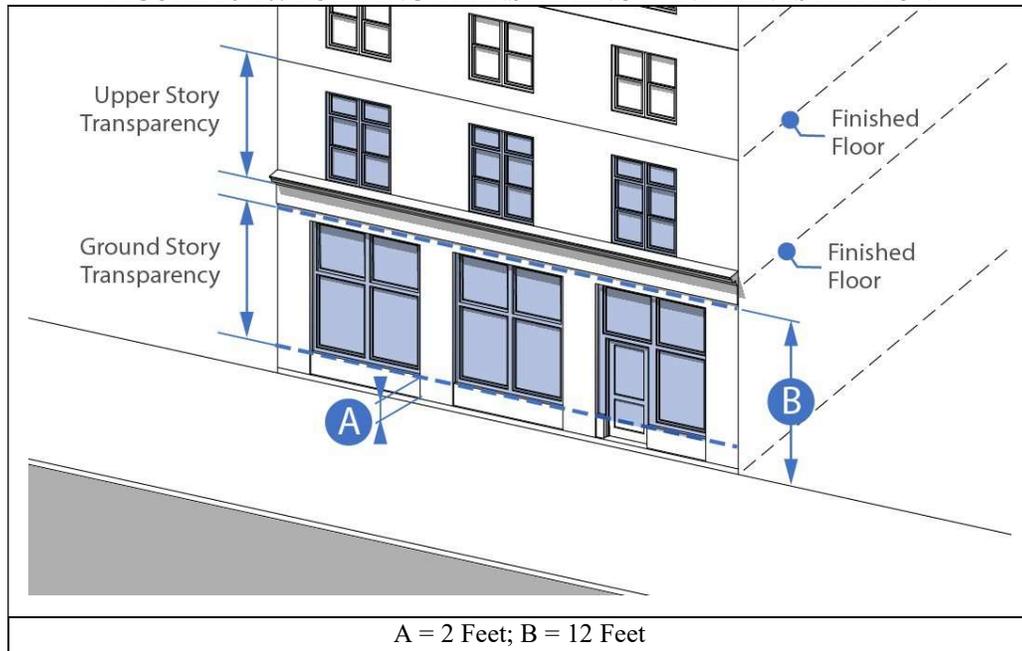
BLANK WALL LIMITATIONS
